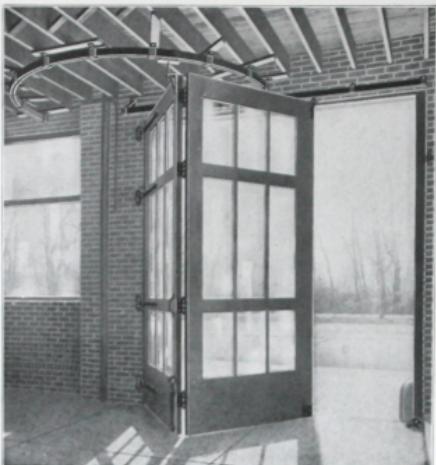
Interior view of "Slidetite" No. 1235 hardware installed in connection with two heavy doors to close one opening. Doors partly opened.
